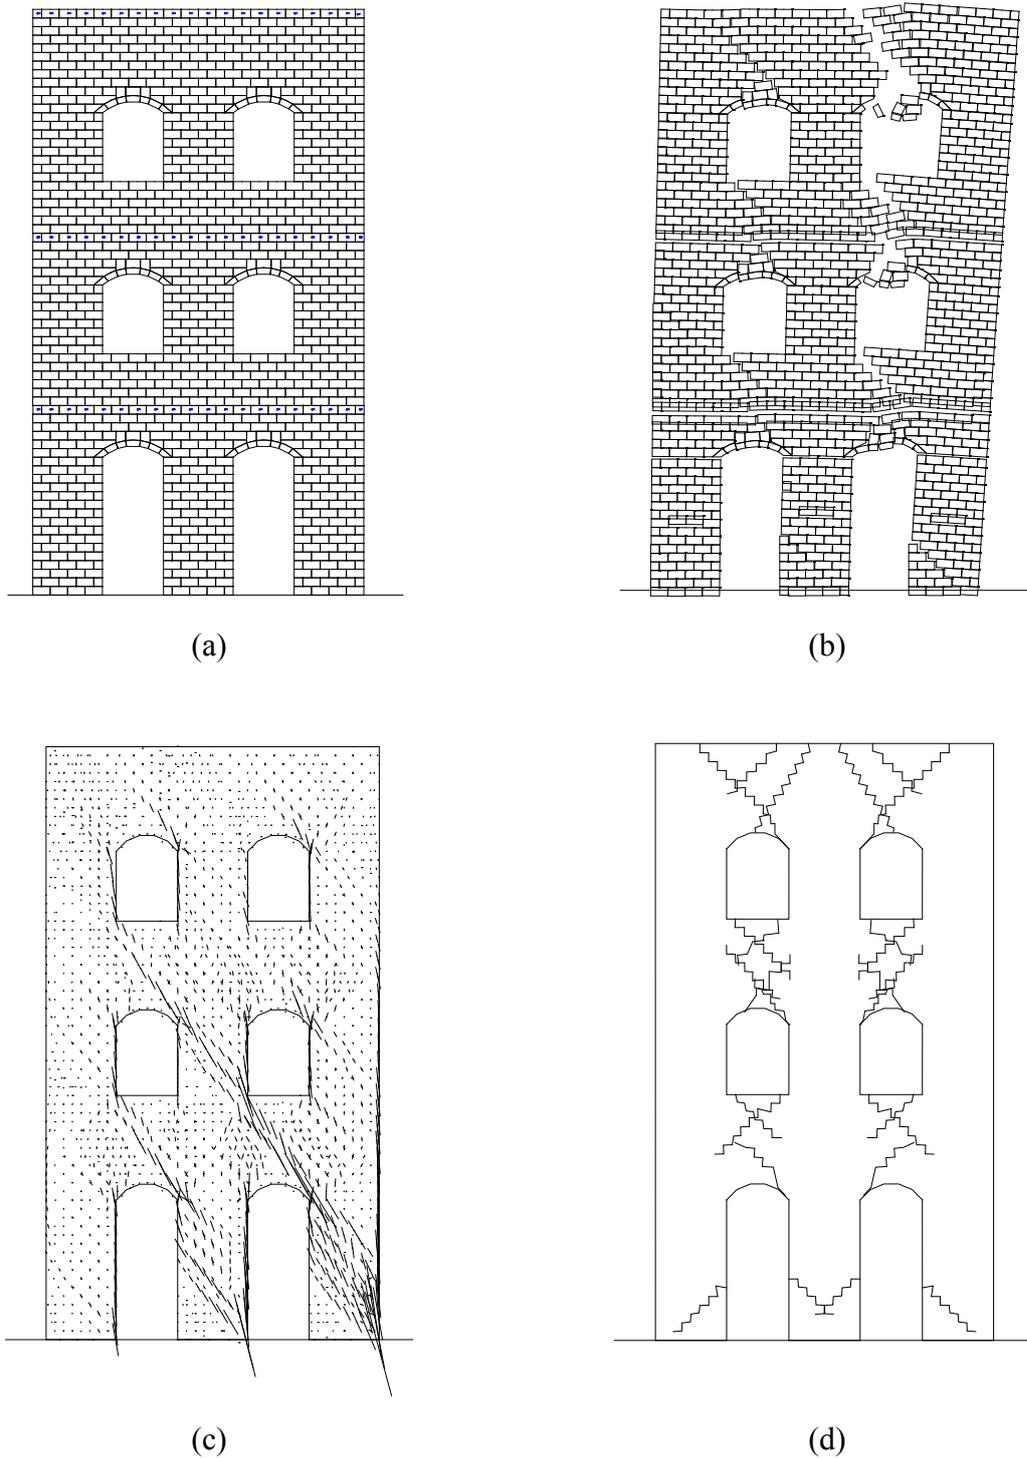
Addition of a Storey to the Standard Masonry wall 1; Seismic coefficient,  $\alpha=0.416$ , (a) Block model, (b) Failure mechanism, (c) Thrust lines, (d) Crack pattern
